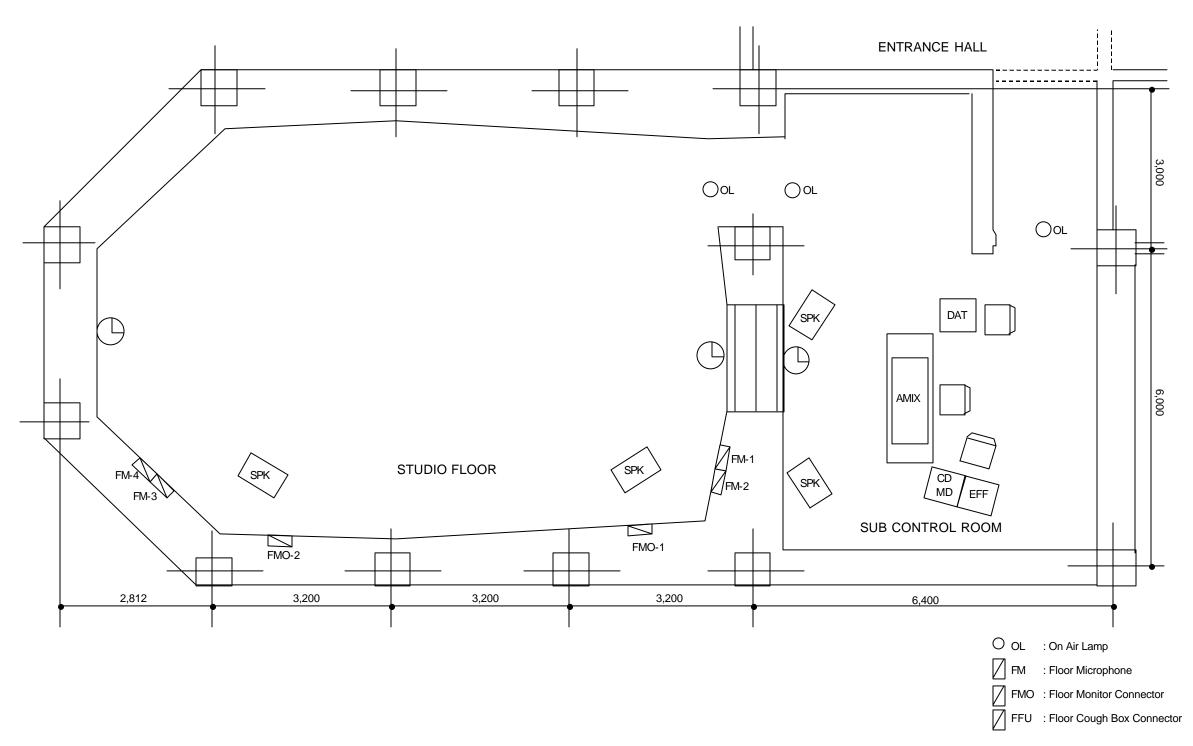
RTD Equipment Layout of Studio , New Studio Block
